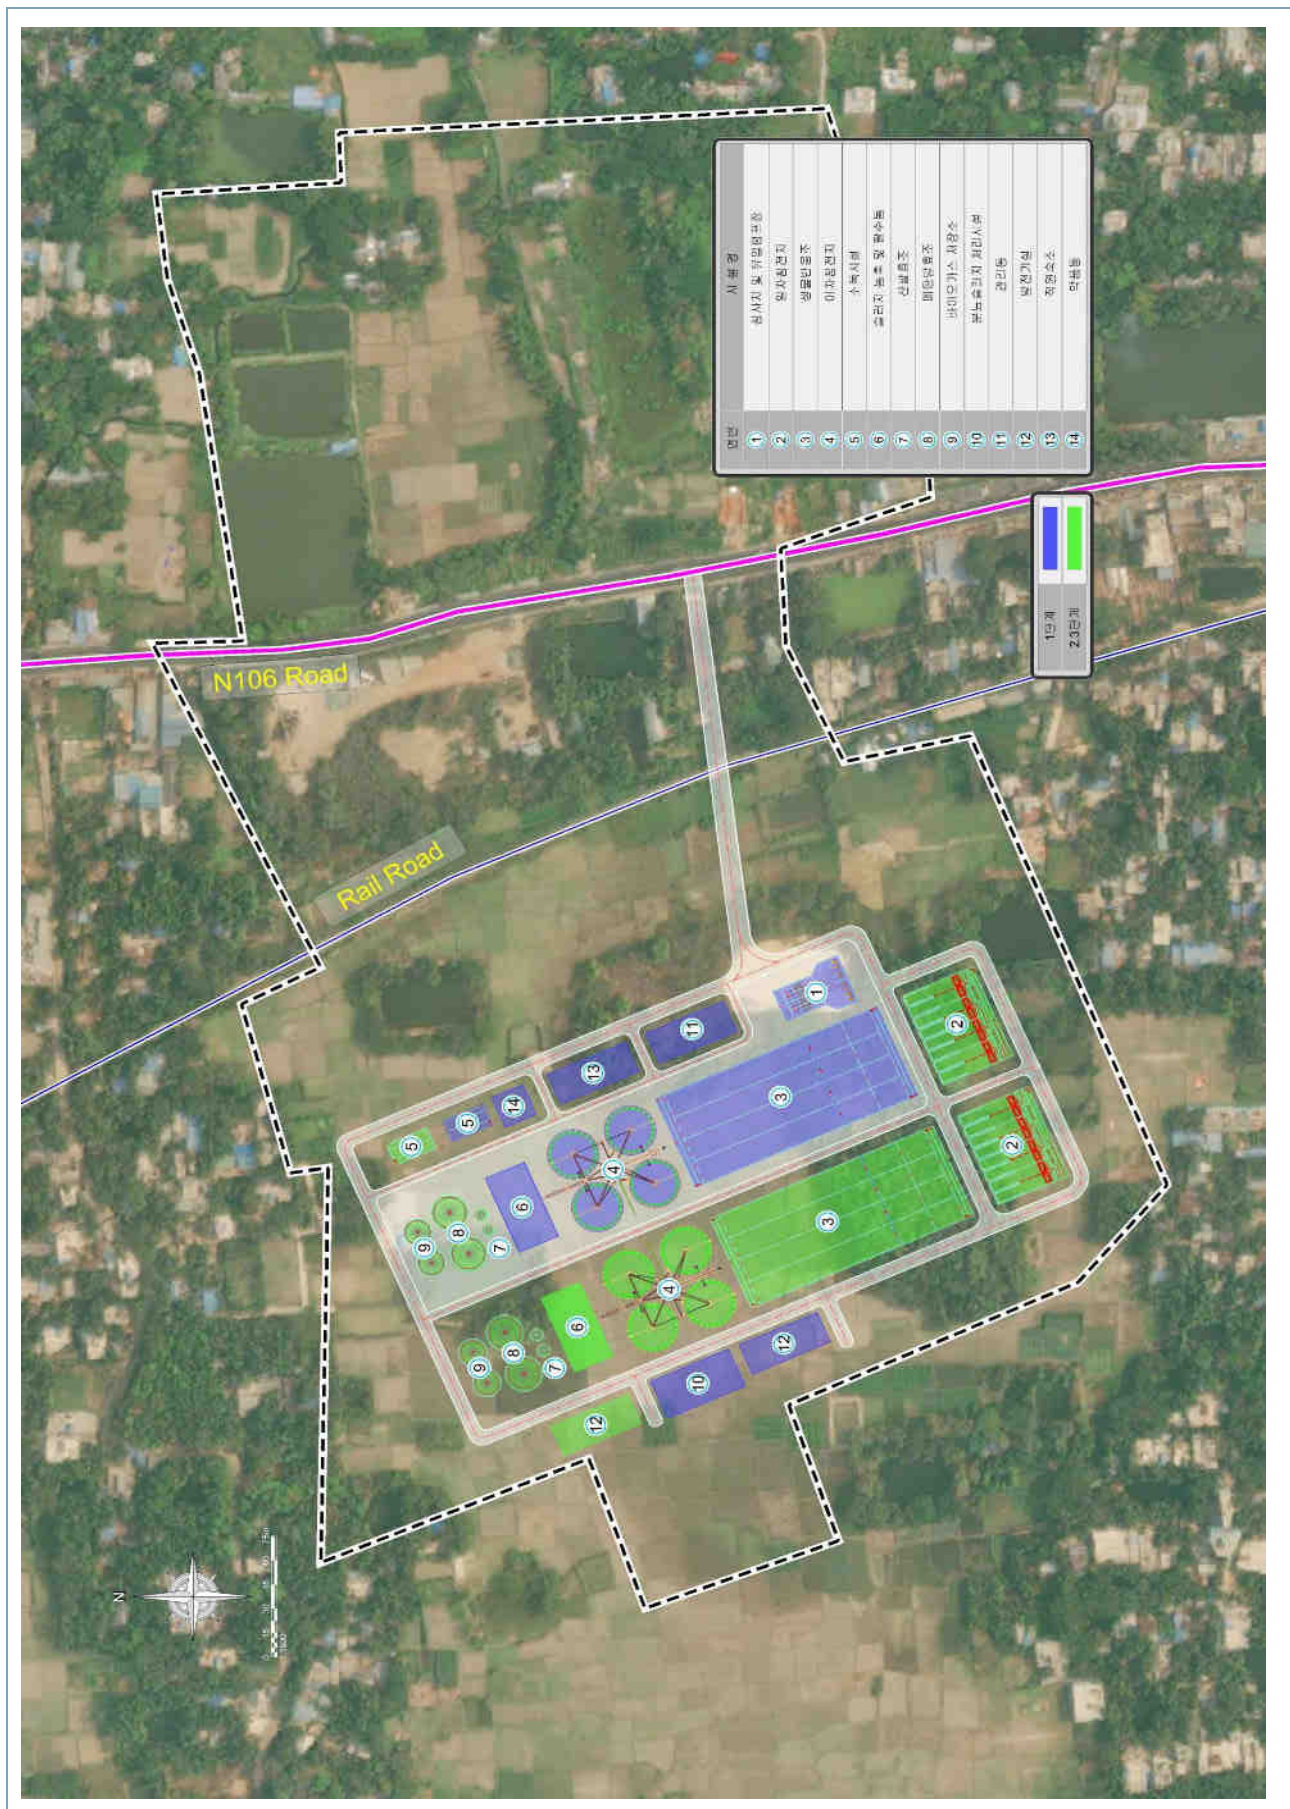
Layout of Sewage Treatment Plant (Option-2)
